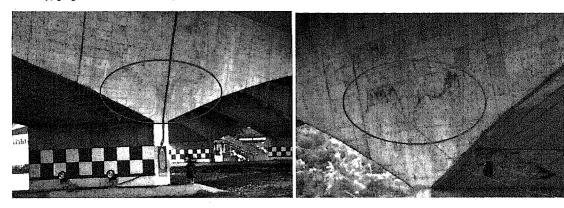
Cracks in the Phra Pokklao (Web of main girder)
